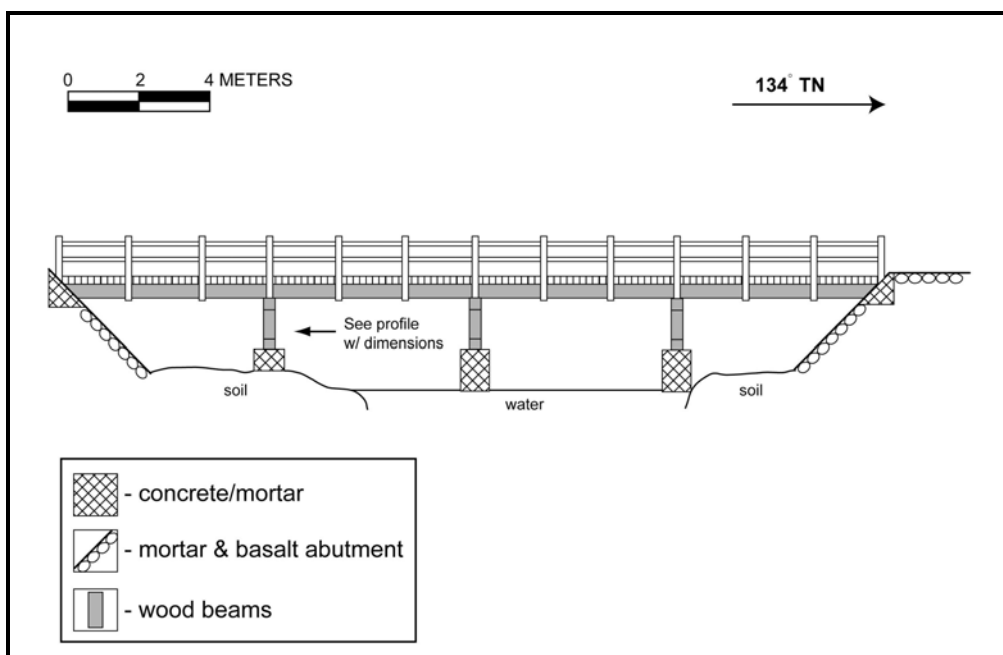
Elevation of SHIP # 50-80-07-6823 (a.k.a. Bridge 3A)
